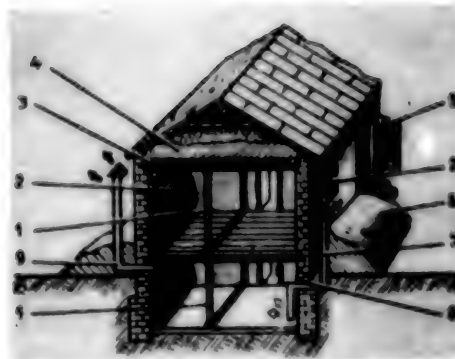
Adaptation of a Residential Basement as a Shelter: 1--ceiling-floor reinforcing frames; 2--windows covered with brick or sandbags; 3--insulation layer; 4--additional dirt fill, 30-40 cm; 5--door seal; 6--dirt fill around outside walls; 7--air intake with fabric filter and baffle; 8--brick-filled opening; 9--air exhaust with baffle. A 15-20-man shelter would require the following materials: lumber--0.9 m³, nails--0.3 kg, dirt--10-12 m³; labor--75-90 man-hours, protection factor--800-1,000.
